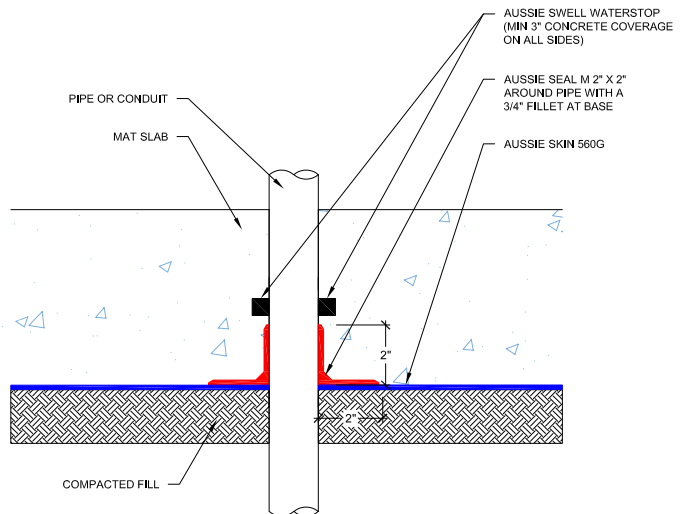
PIPE PENETRATION THROUGH SLAB
